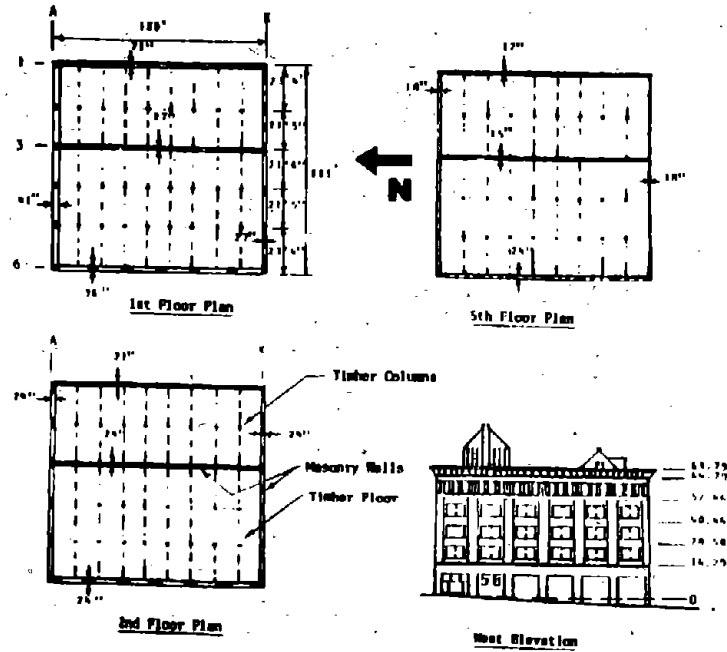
TYPICAL FLOOR PLAN AND ELEVATION FOR US-URM BUILDING
